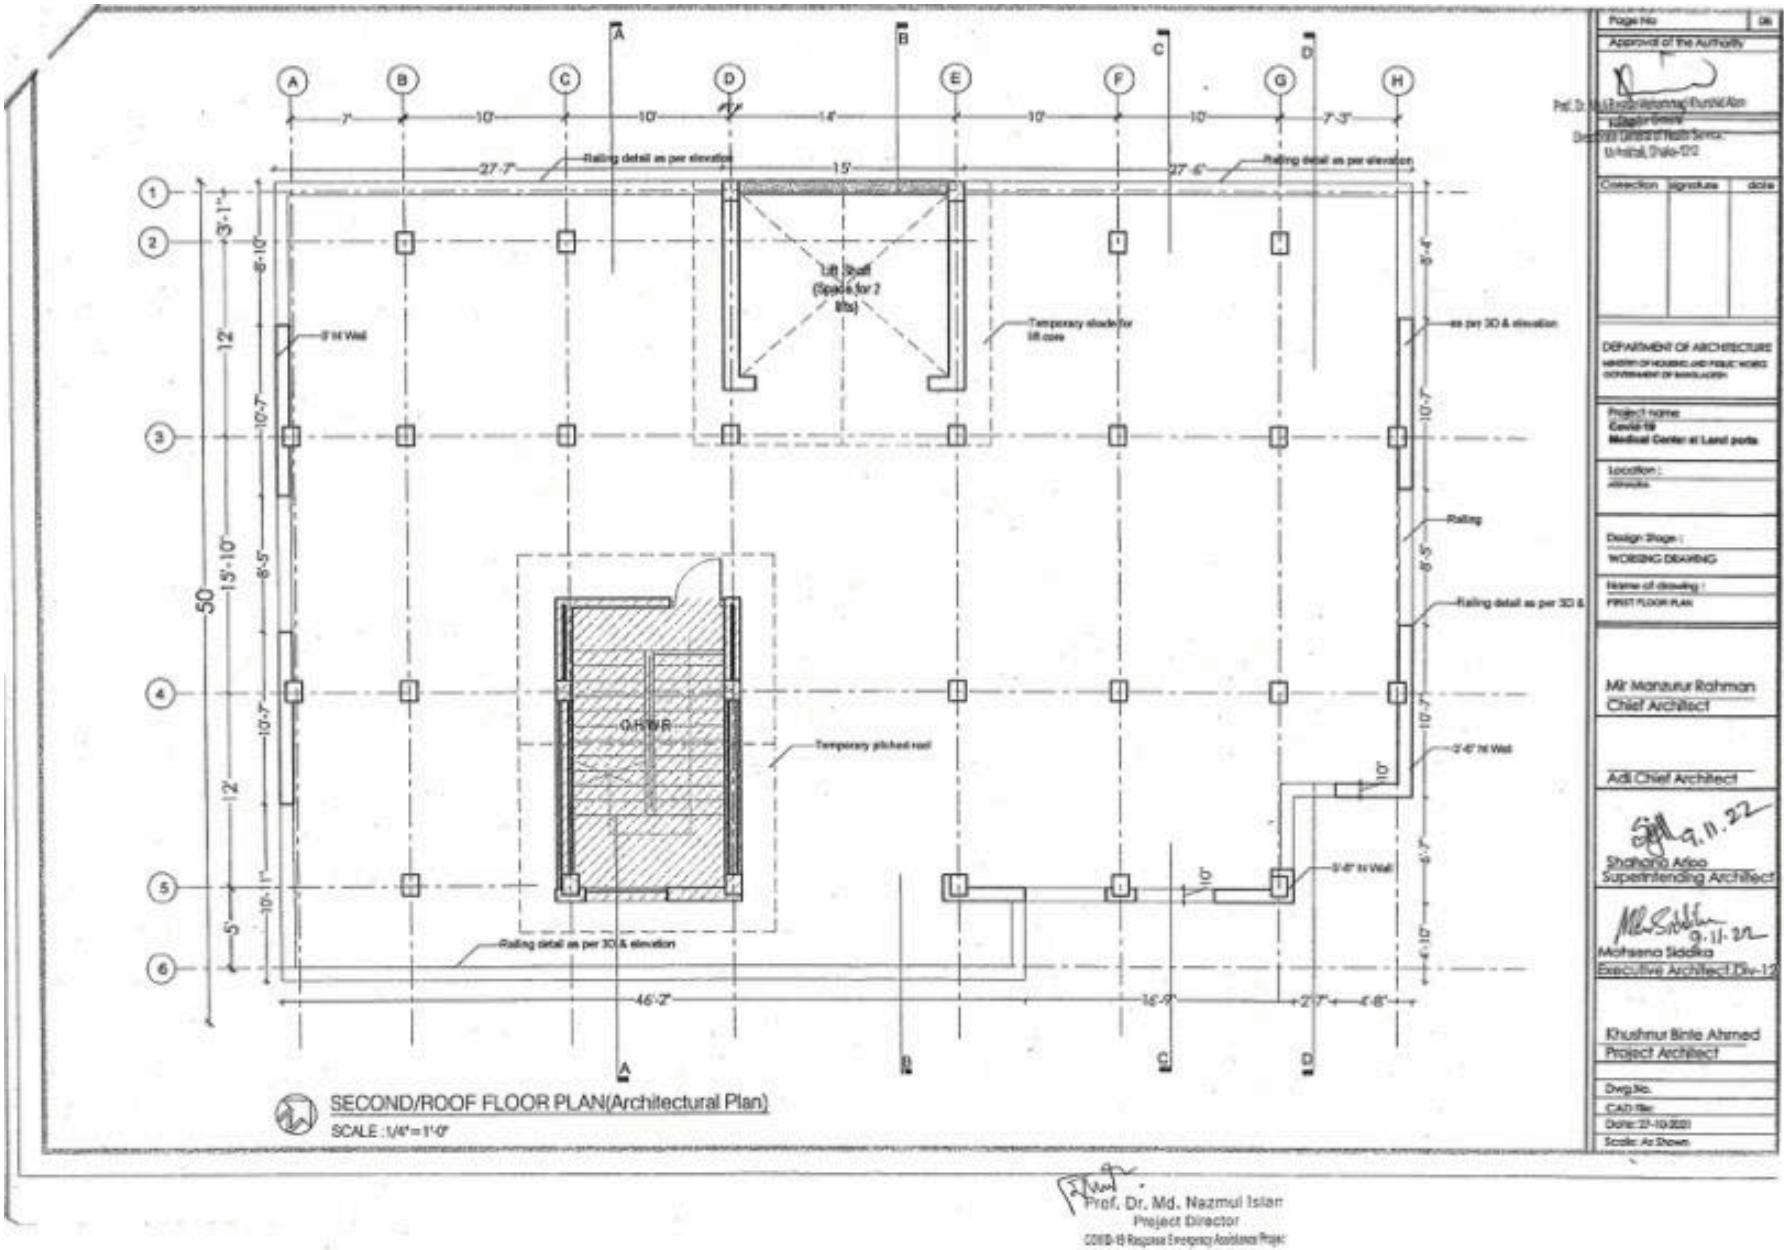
Second Floor Plan of the Proposed Medical Facilities
